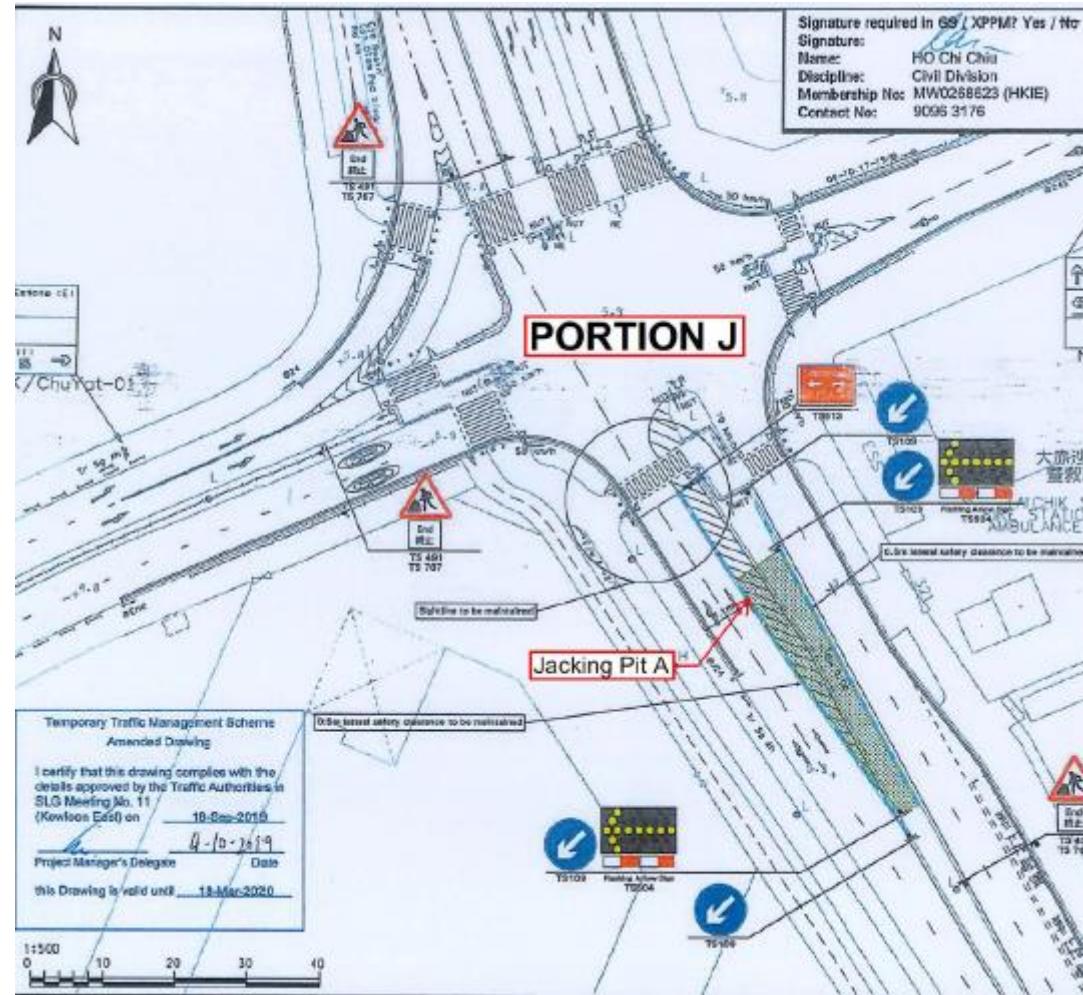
Location Plan for Portion J – CH. A13+50 to CH.A 14+00 (Pit A)
